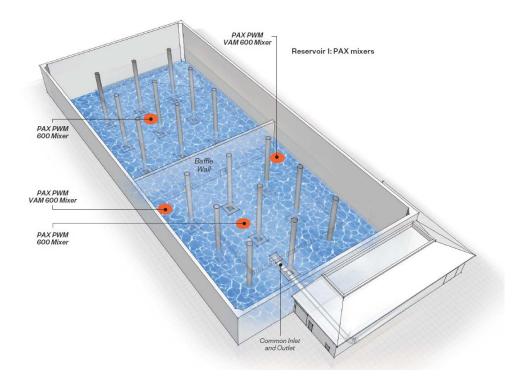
Reservoir 1 Proposed PAX Mixing System Layout
